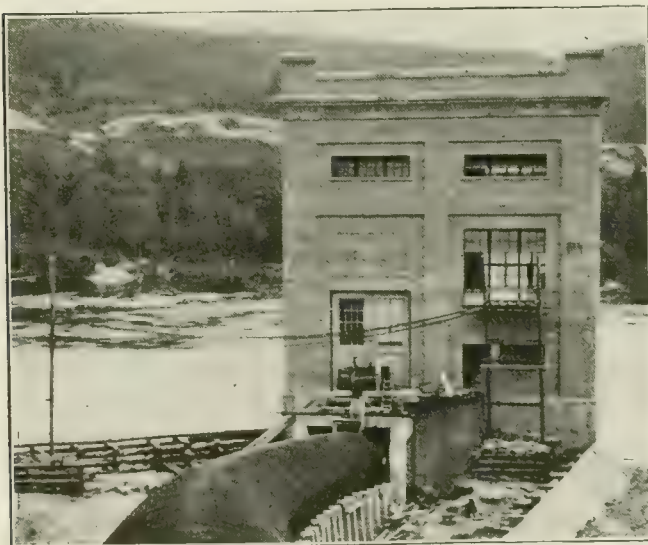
WOOD-STAVE PENSTOCK JOINED WITH STATION BY STEEL THIMBLE
